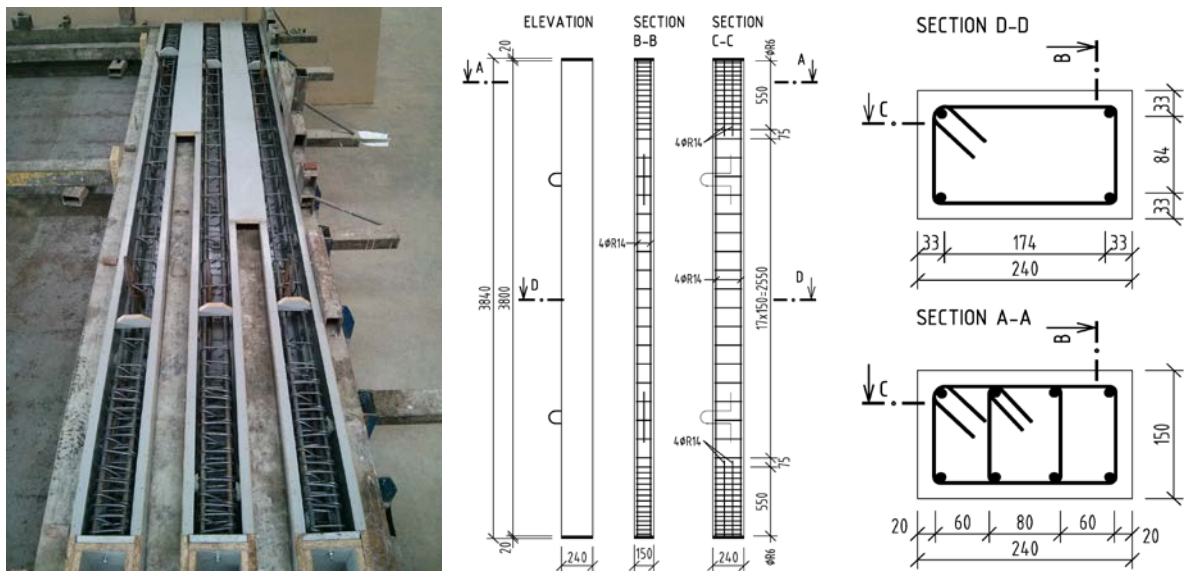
The shape and reinforcement of columns for S3 series ($\lambda=89$)
